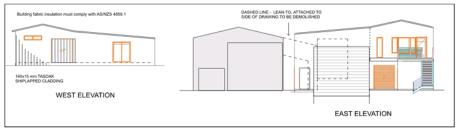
West and Eastern Elevations (Adorn Drafting, 2023)
